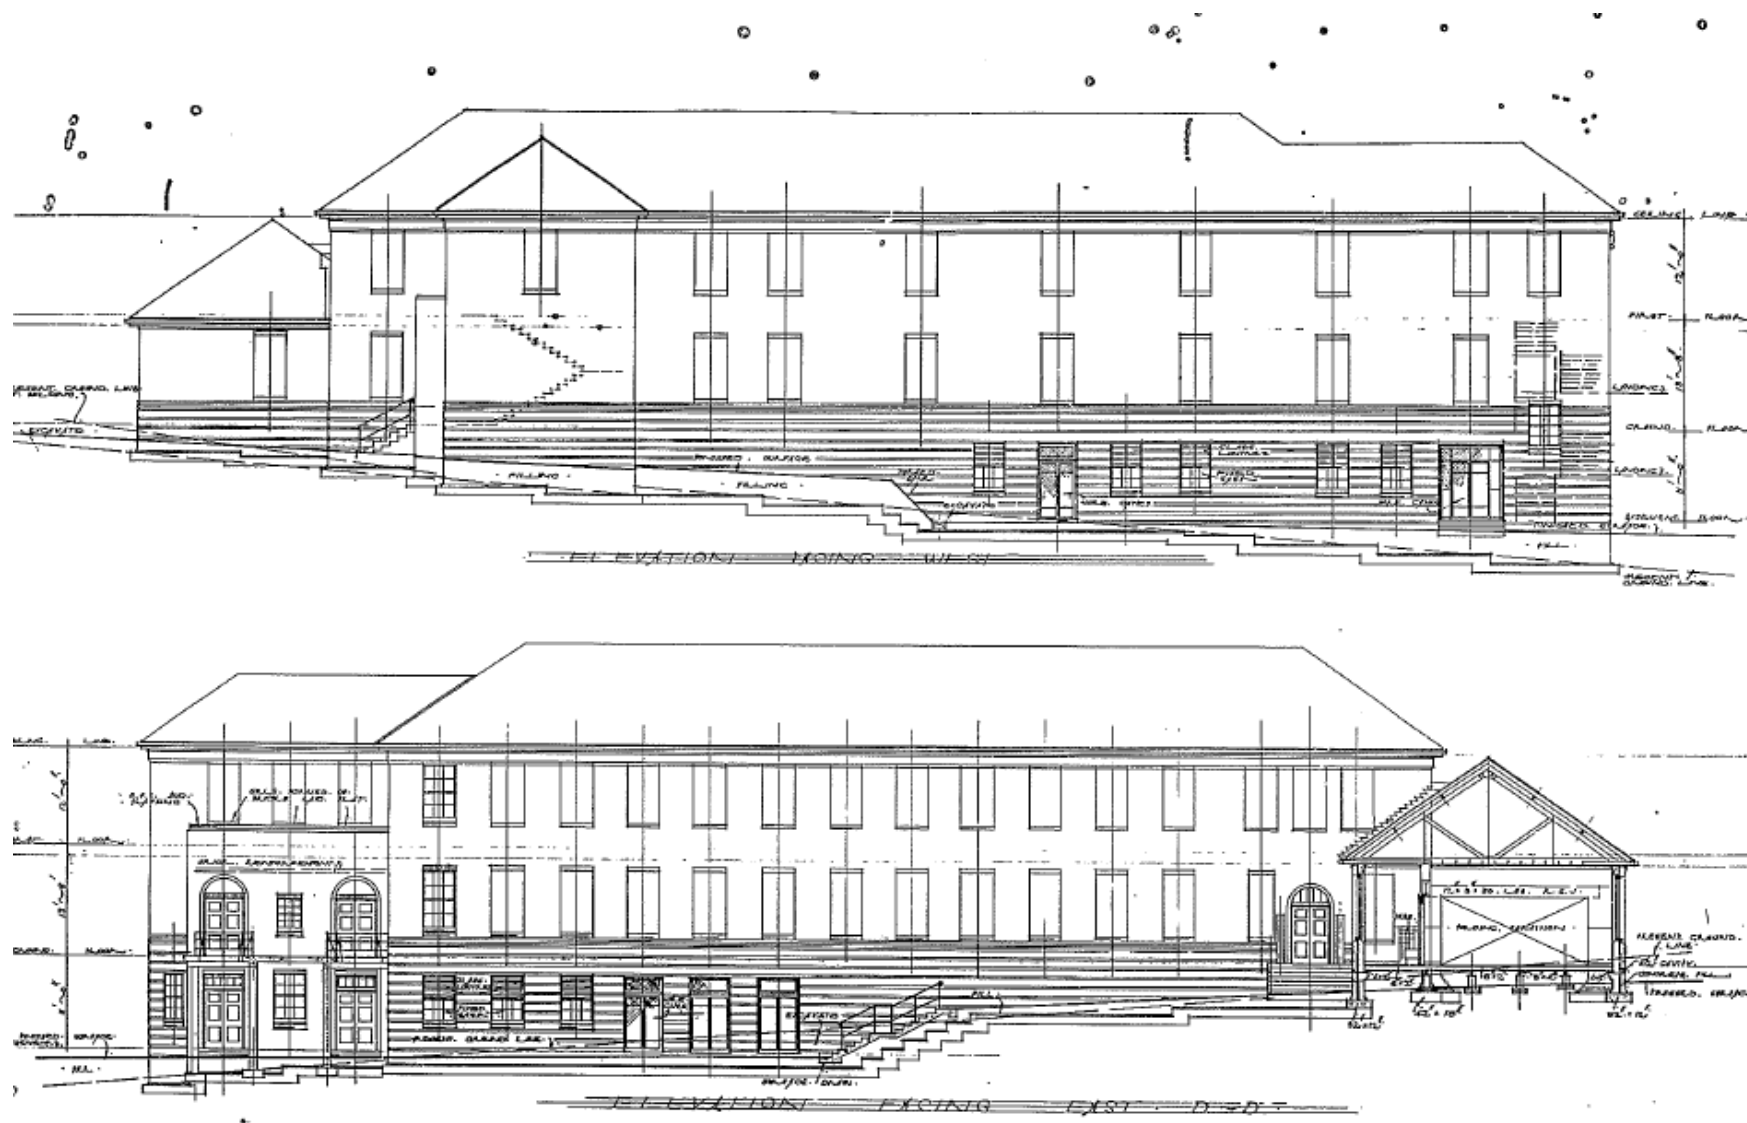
1934 West and East Elevations of the Boys building, currently known as River building. Source: Government Architect plans, copy held by NSPS
